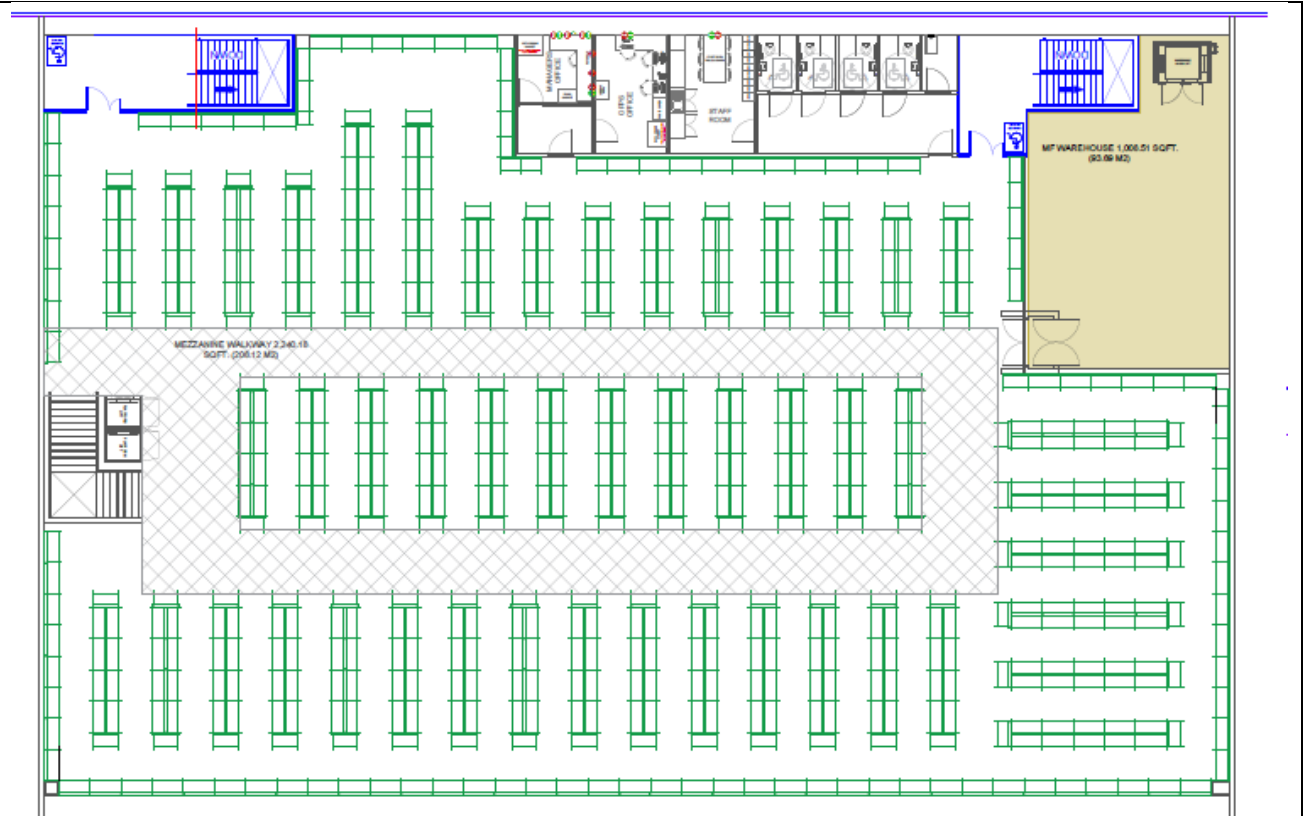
(above): Proposed First Floor layout (Mezzanine)
